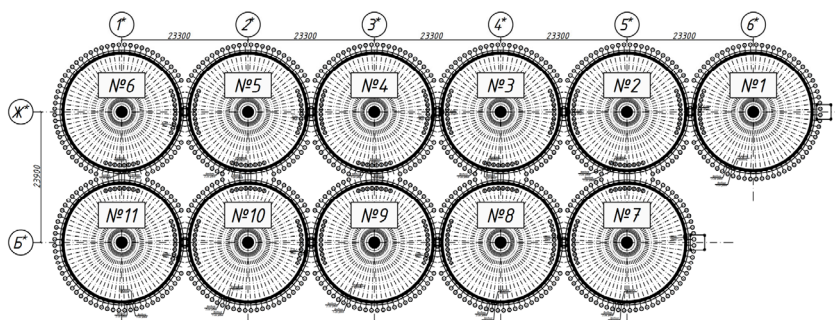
Layout of silo tanks in the damaged grain elevator
